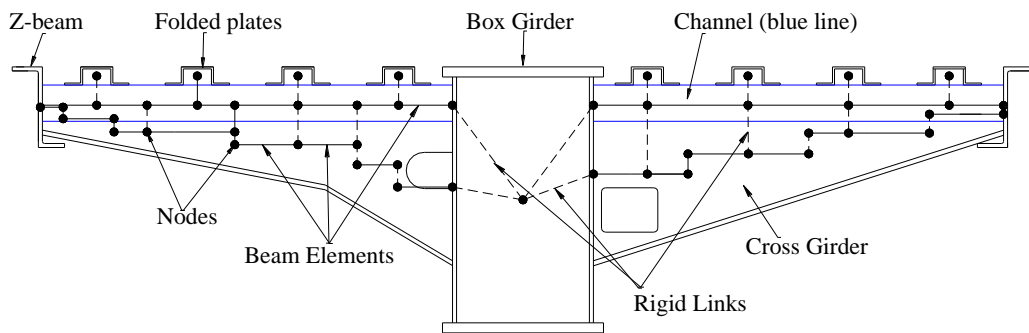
Typical single FRW model idealizations: cross girder modeling
